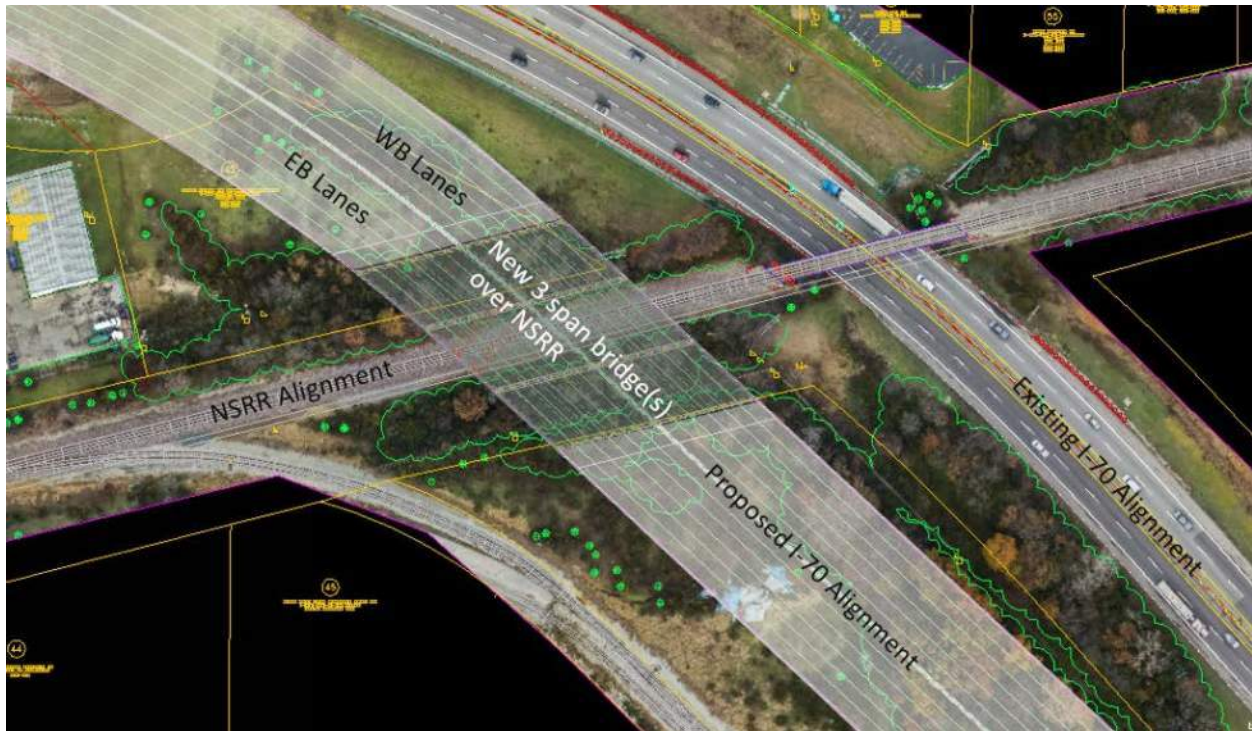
I-70 Mainline (Realigned) Bridges over NSRR
